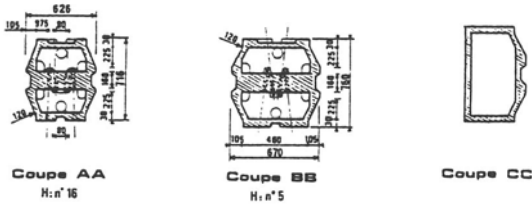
A slender structure: the mast of a cable-stayed bridge.
